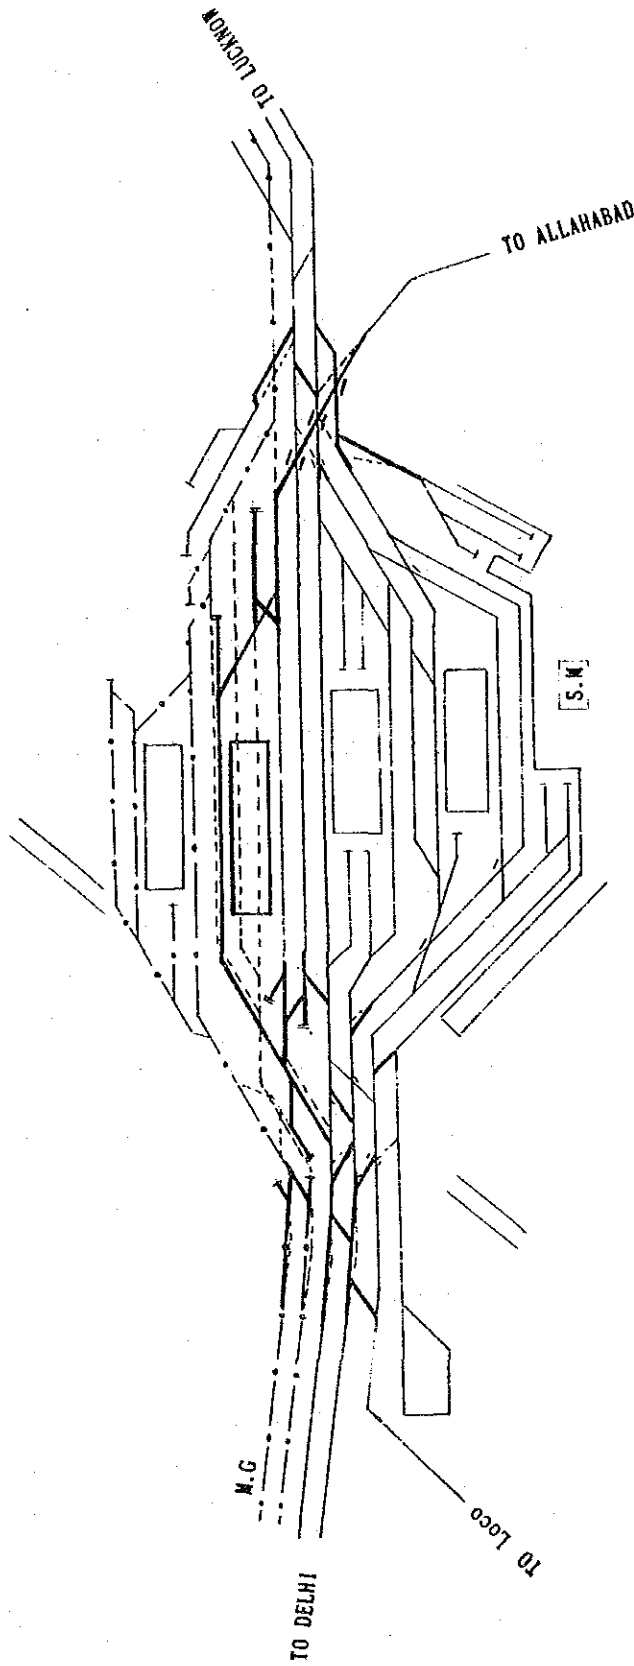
Kanpur Central Station Yard Improvement Plan
